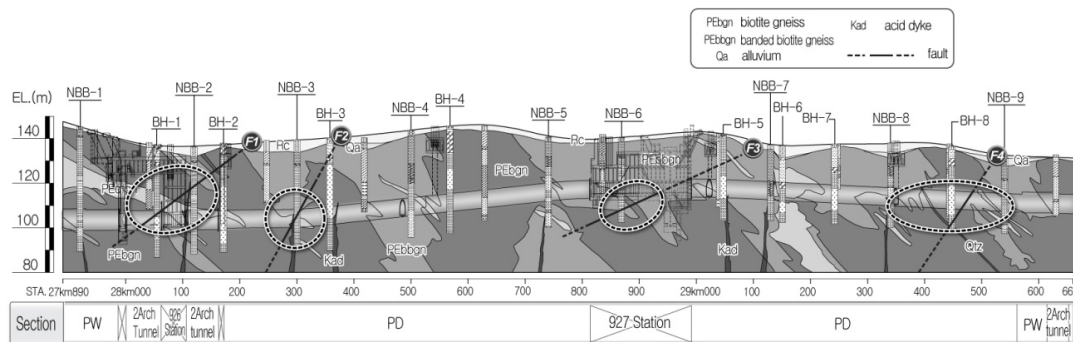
Geology and tunnel longitudinal section (PD: double lane track section, PW: enlarged section)
